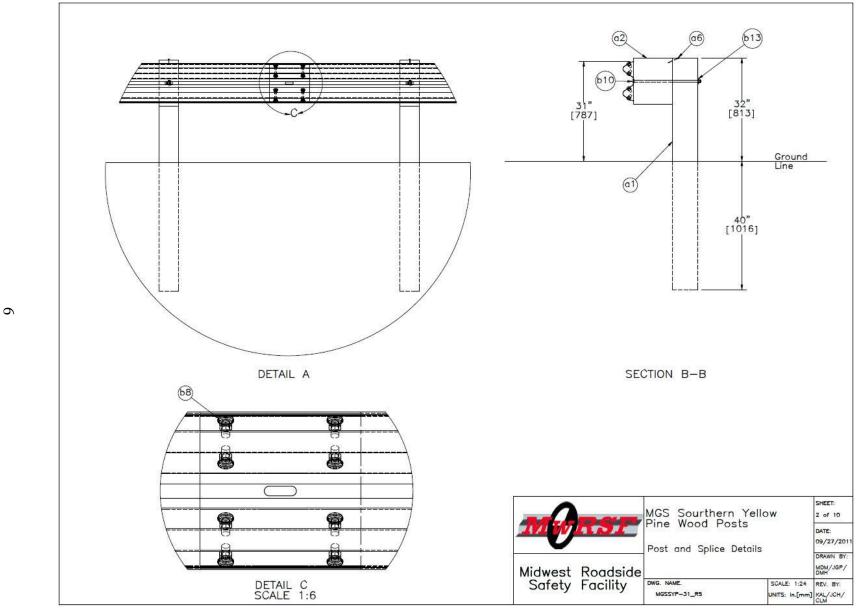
Post and Splice Details, Test No. MGSSYP-1
